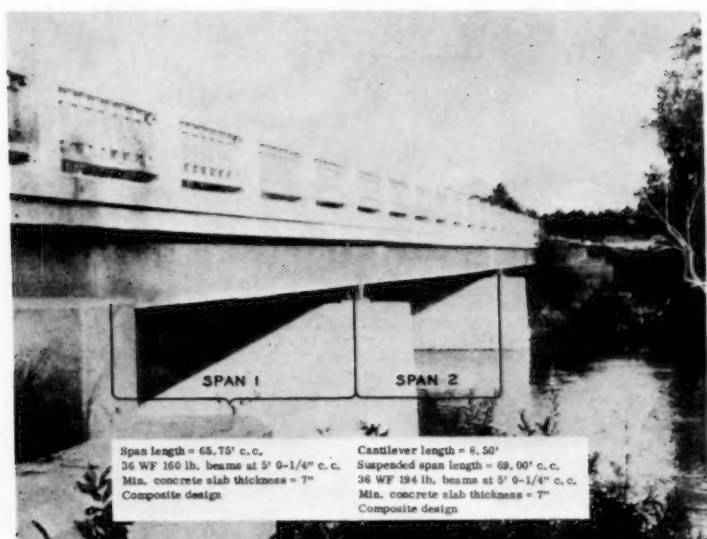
Bridge B1 of 18-12-2. On route M-61 near Temple. Rolled beam cantilever-type bridge.
